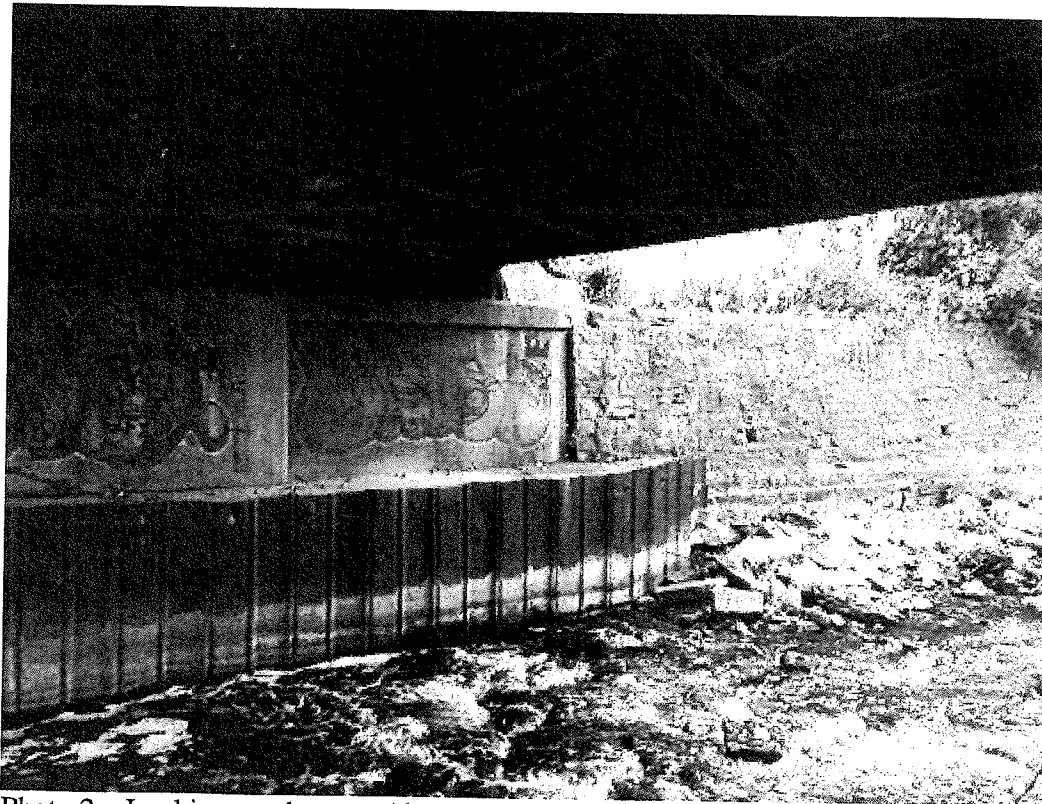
Looking southeast at Abutment 1 of BR 88.74.
